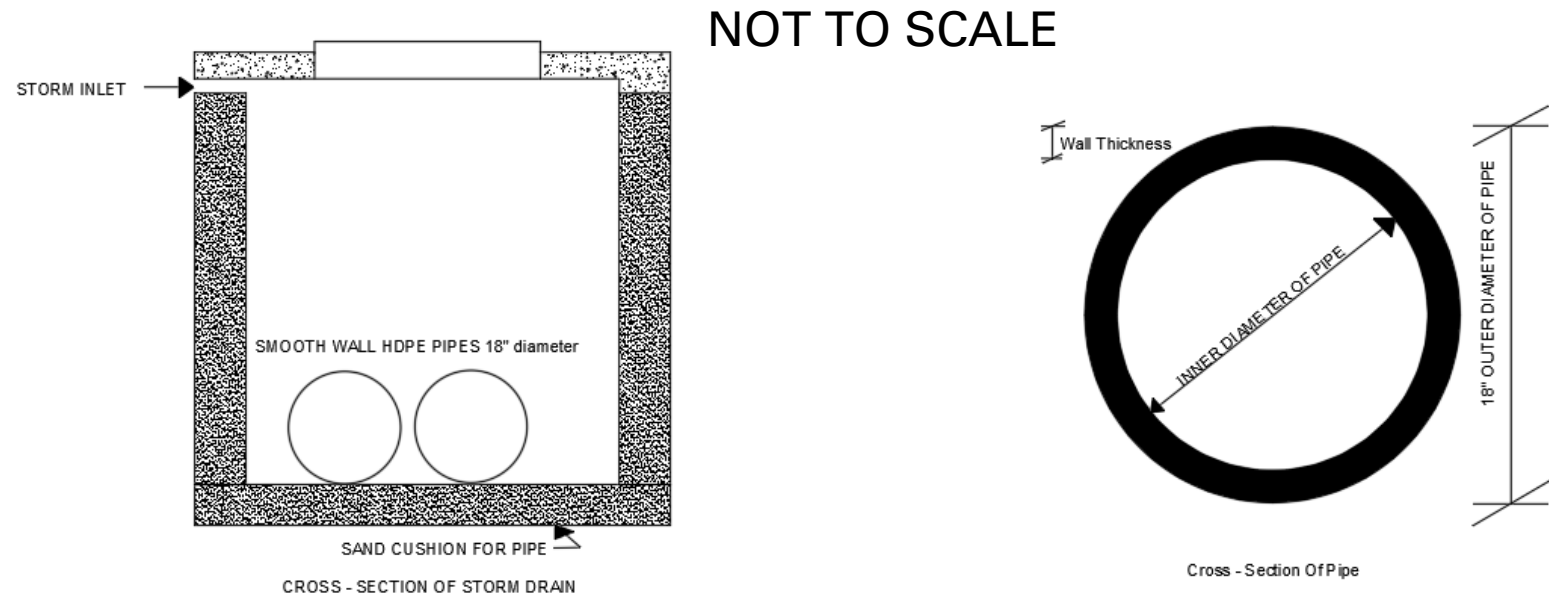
cross section of final double 18" smooth wall HDPE pipe
